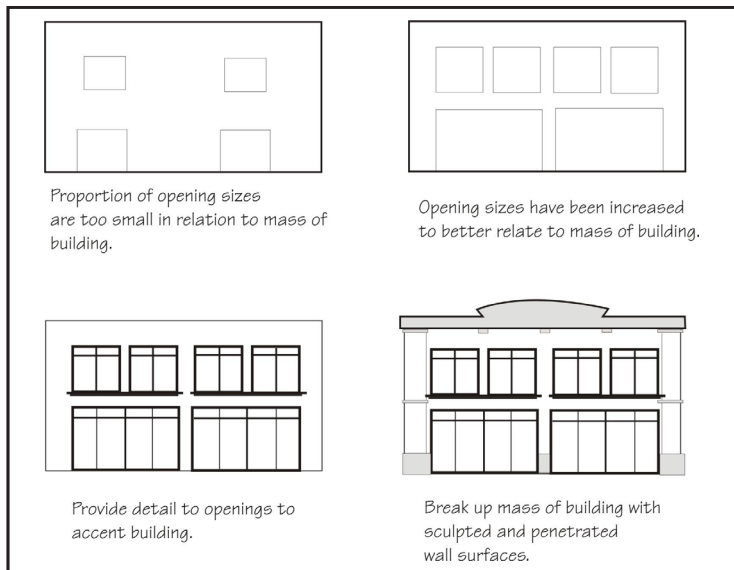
Building design should incorporate elements proportional to the height and width of the building face
